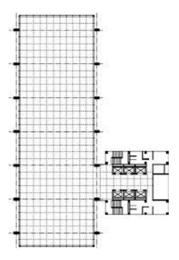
Floor Plan. ©Skidmore, Owings and Merrill
